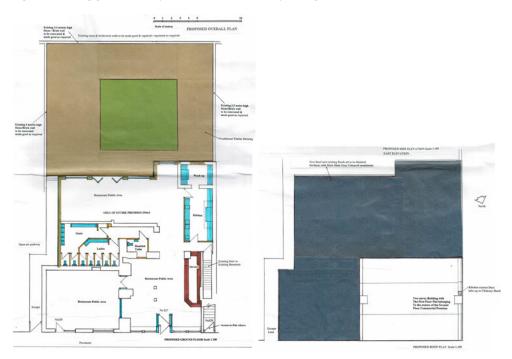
Proposed ground floor plan (left) and first-floor plan (right)
